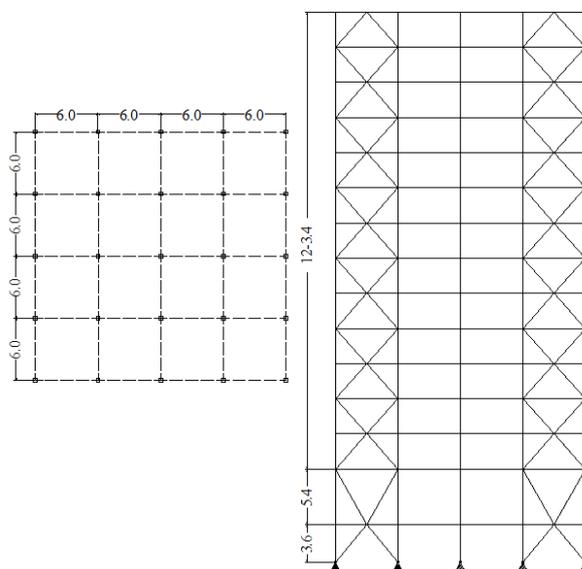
Floor plan and elevation view of the archetype building (all dimensions are in meters)
